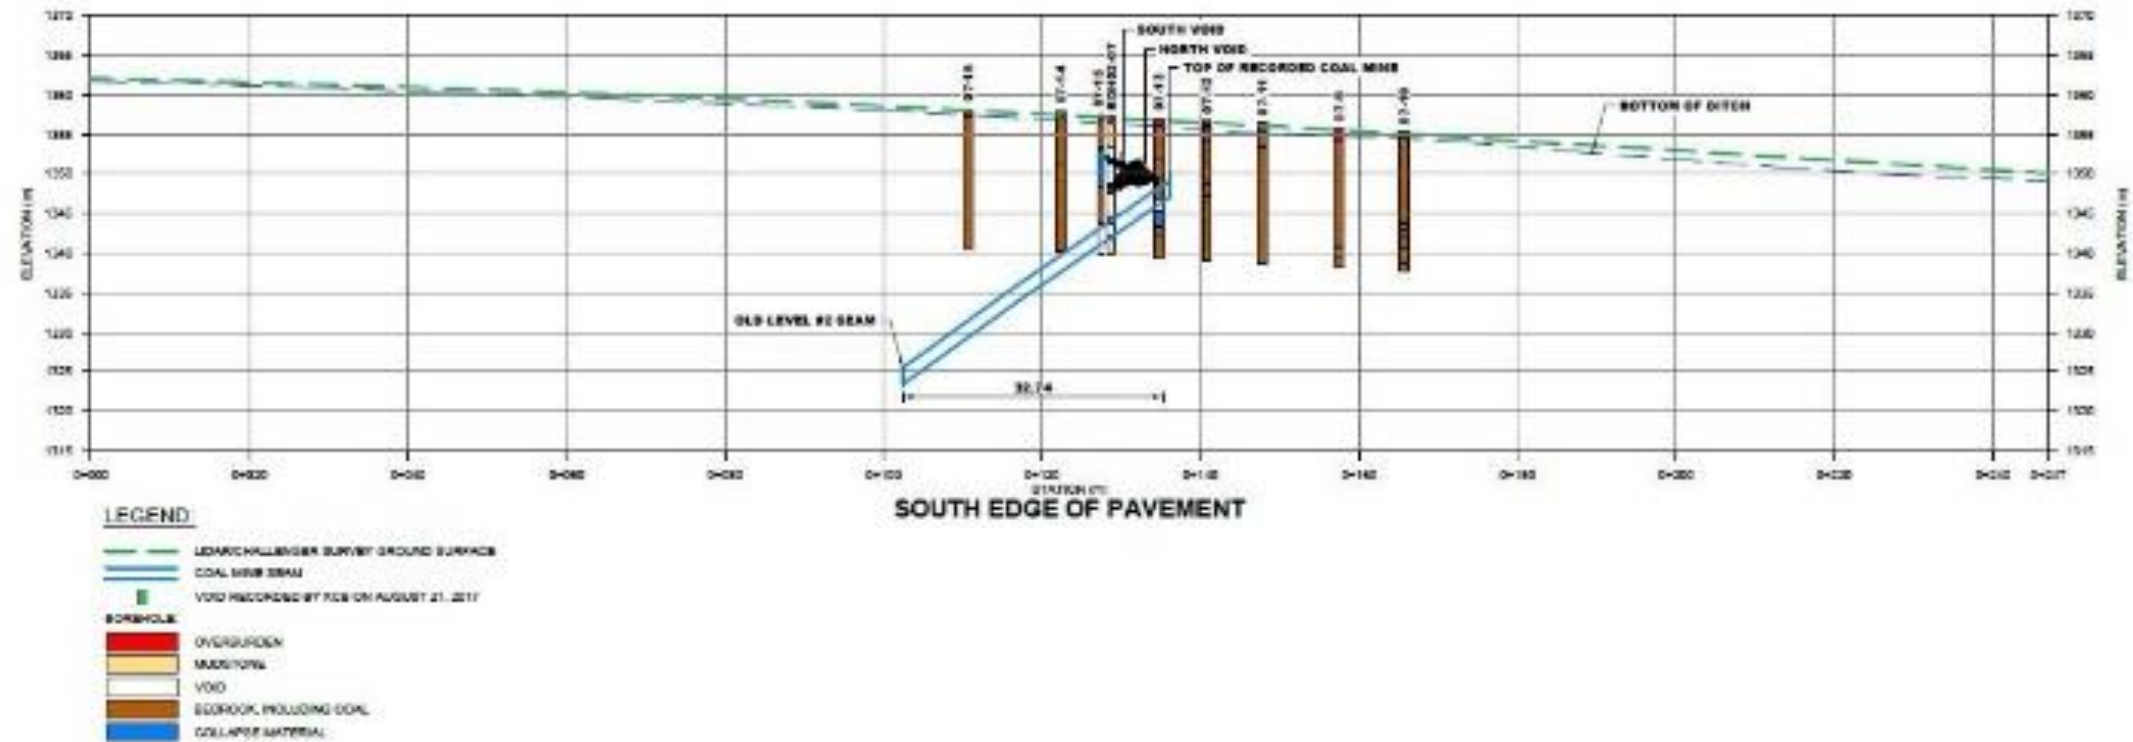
Cross section through Civil 3D model along Line 01 (south edge of pavement)
